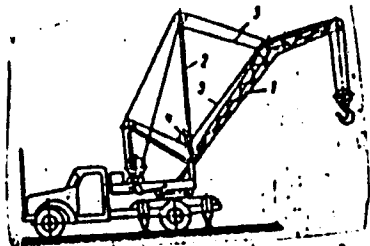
1 - boom; 2 - strut; 3 - boom pulley system; 4 - diverting pulley; 5 - load cable.
